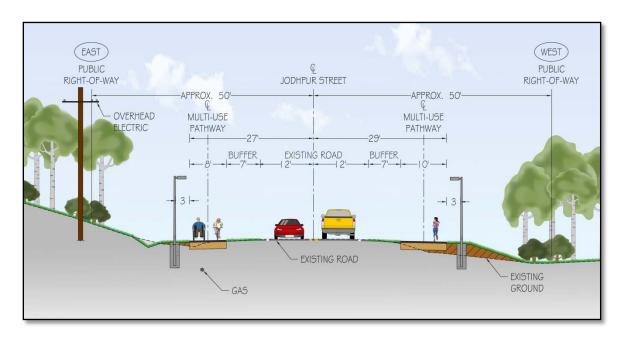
Pathway Typical Section – Jodhpur Street (preferred)
